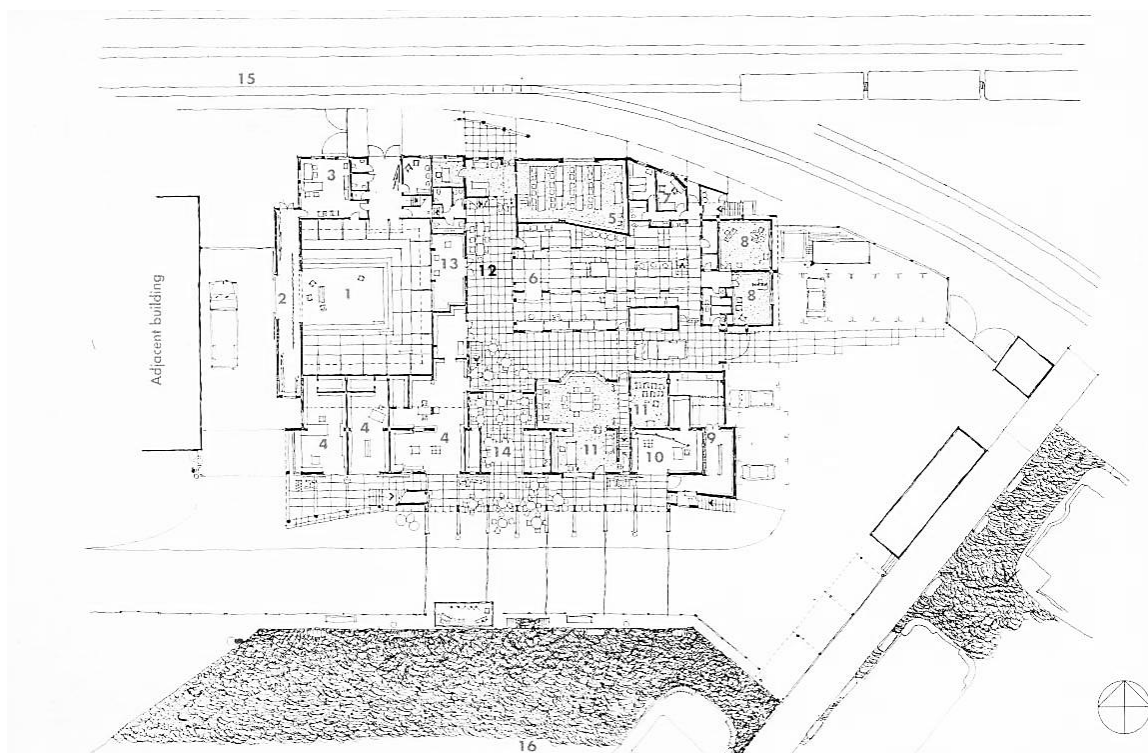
Ground Floor Plan of the BAT Centre (1996)
